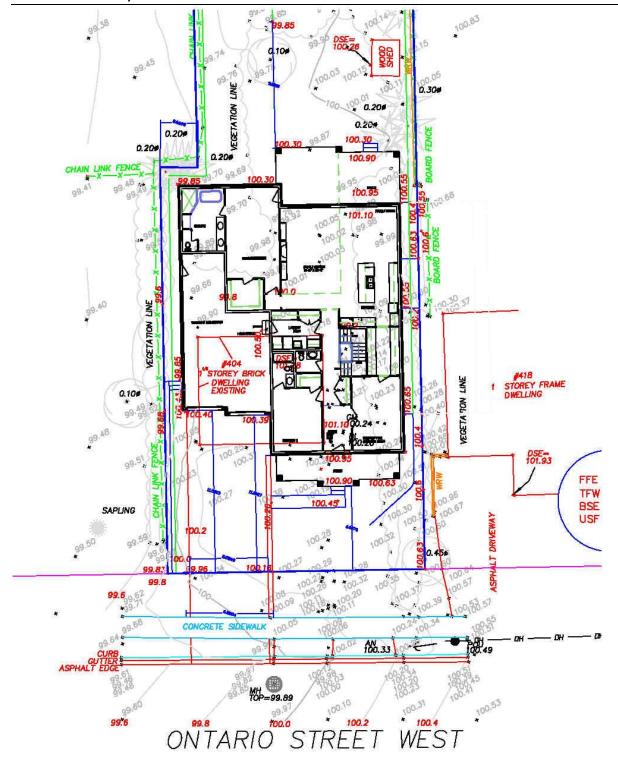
Proposed Site Plan for New Building at 404 Ontario Street.
